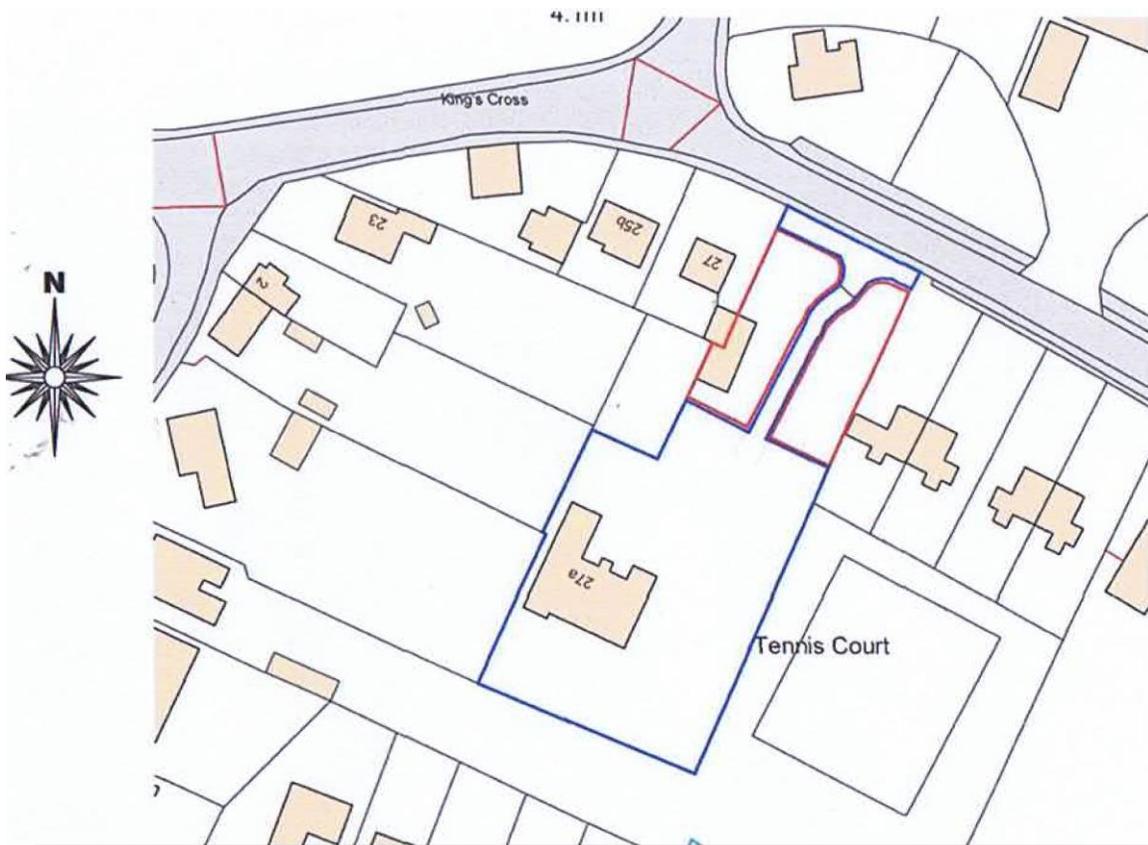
Plan showing the location of the proposed development site at a scale of 1:1,250, (extract from Architects plan)
